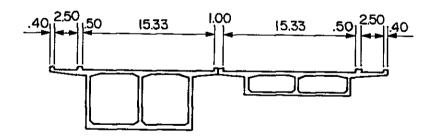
CROSS SECTIONS OF BOX GIRDERS
